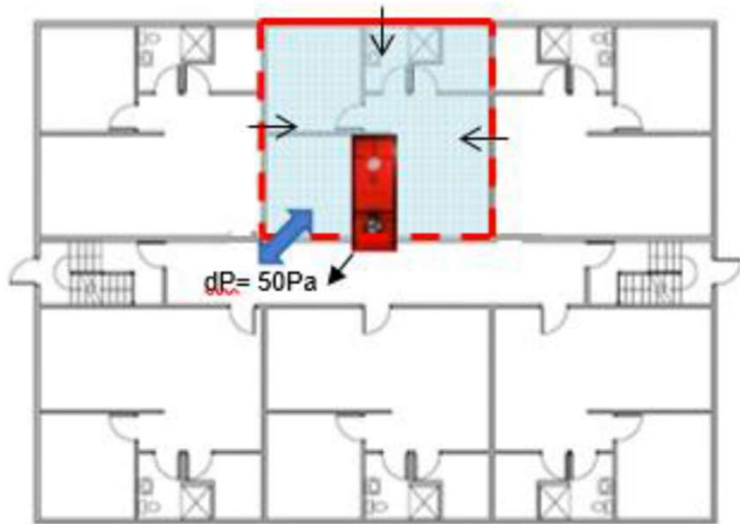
Single-unit exterior test for three units in a single-story garden-style building
